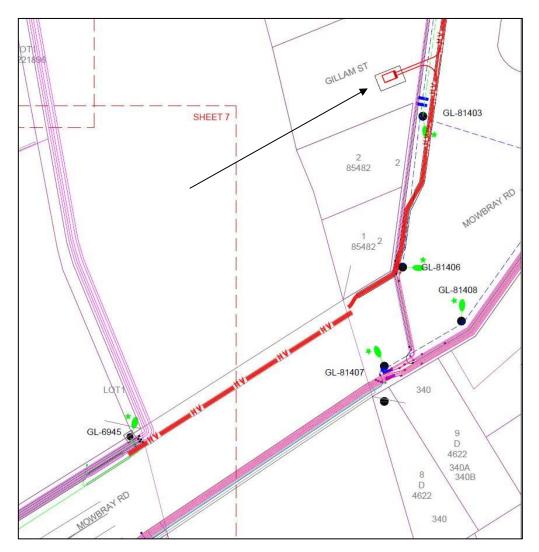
Detail of plan showing the location of the kiosk (arrowed) and extent of trenching for electrical cables.
